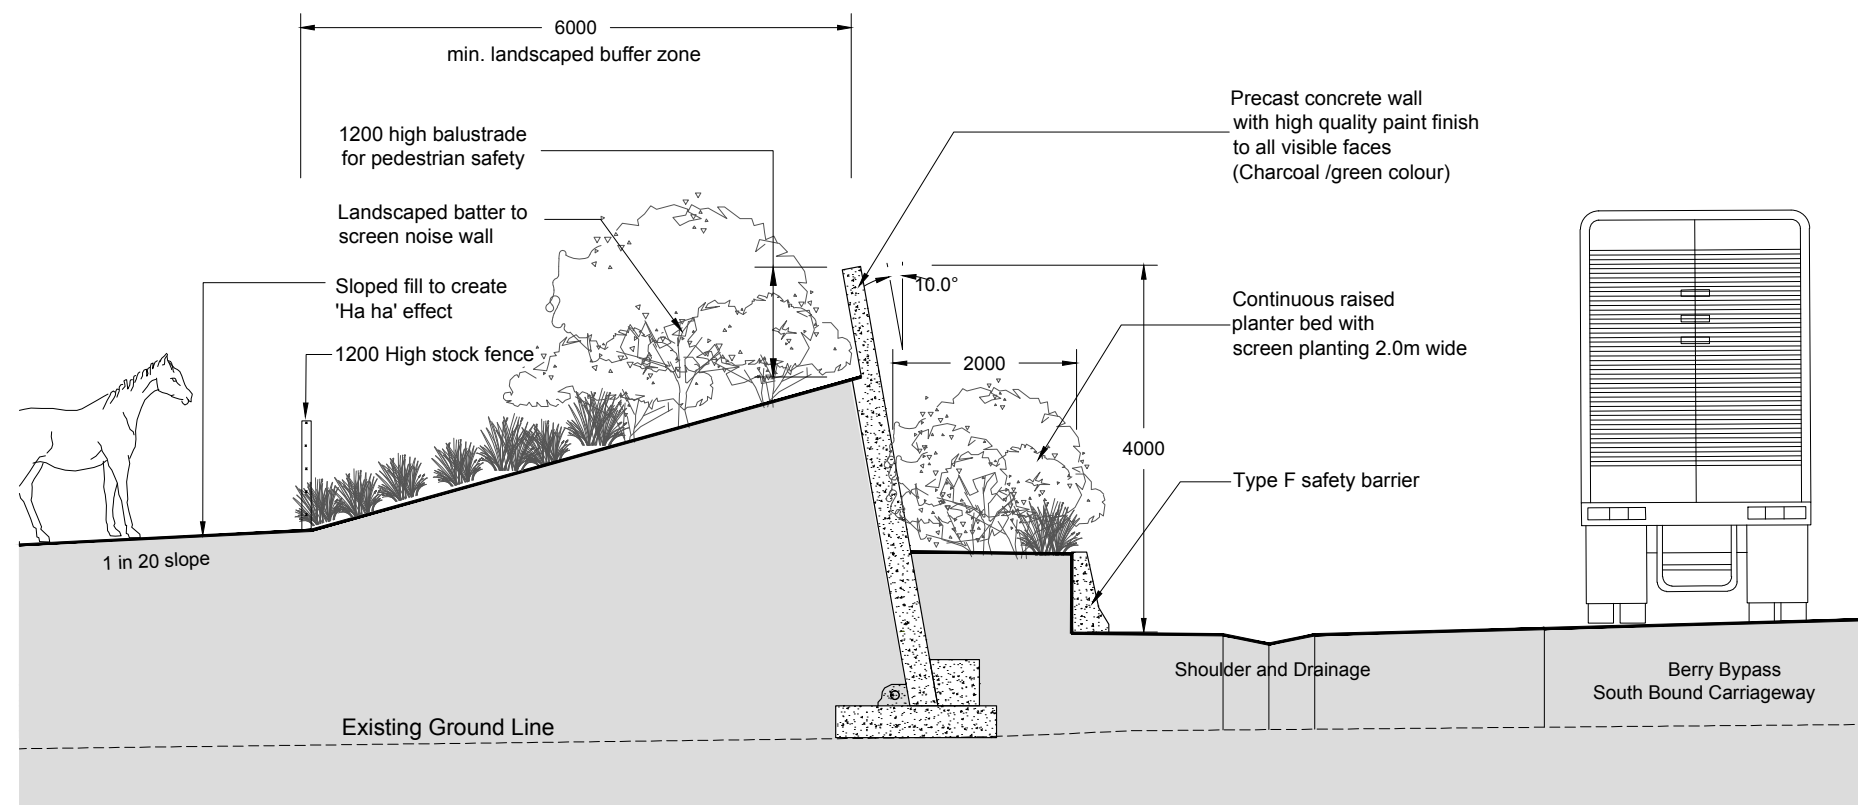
Noise barrier option 1 - precast concrete wall typical cross section.
